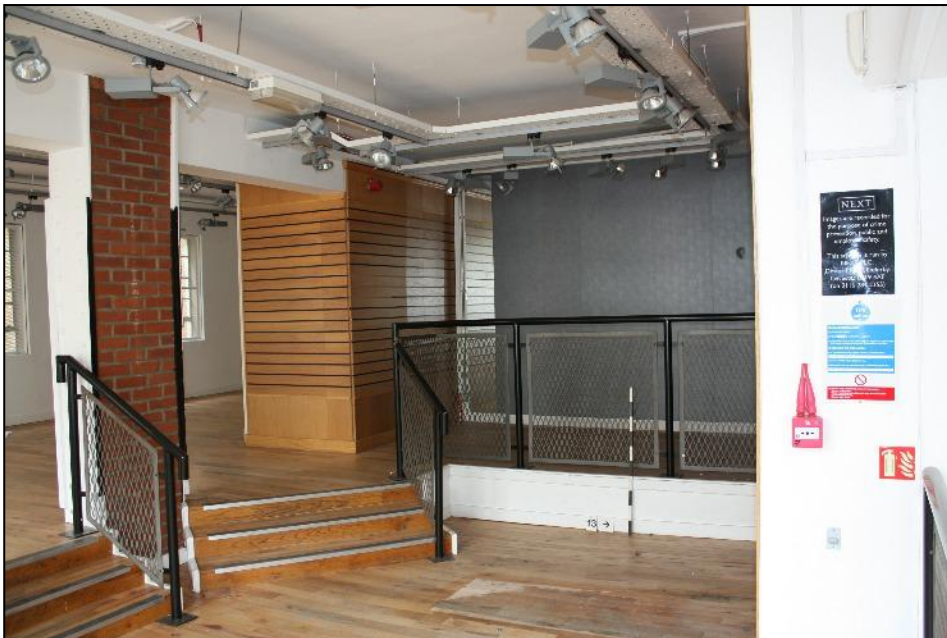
View towards west end of unit E, first floor area of No. 201, before soft strip.
